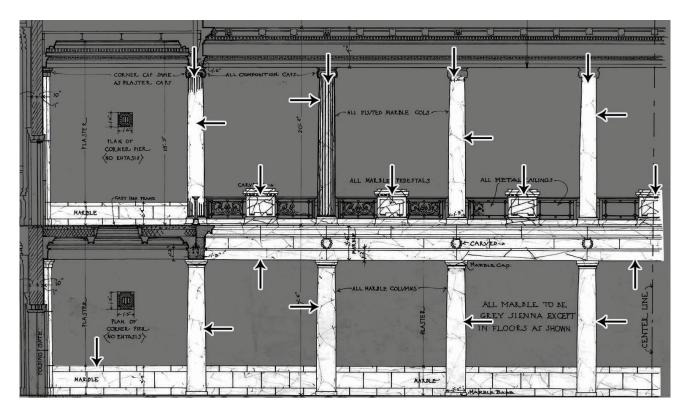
Modified from Alden & Harlow, Architects, Hall of Sculpture, Long Section Towards Mawhinney St. Rooms 128 and 228. May 14, 1904. Arrows indicate Pentelic marble
